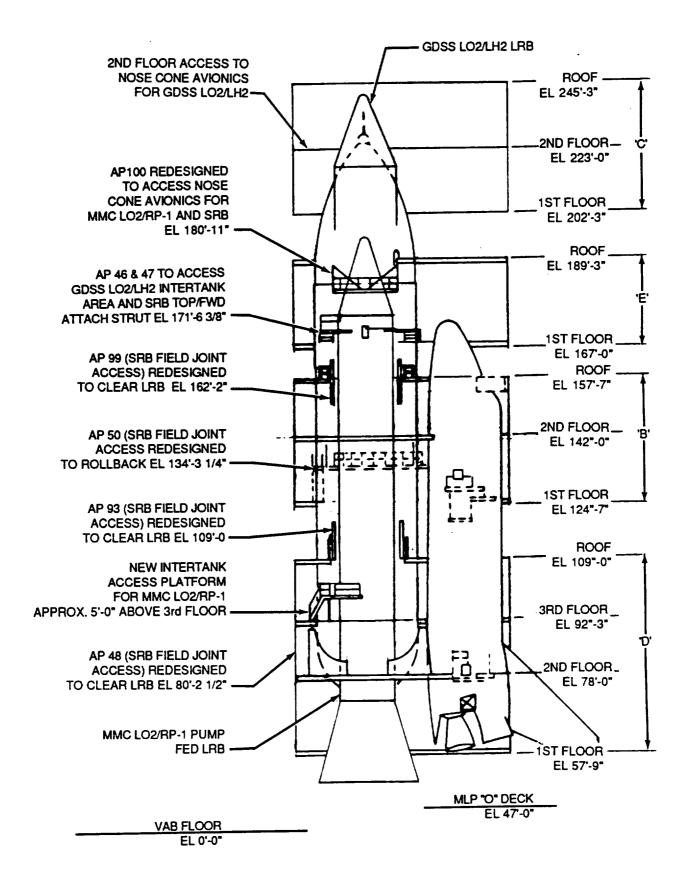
New LRB Access Elevation (High Bay 3).
